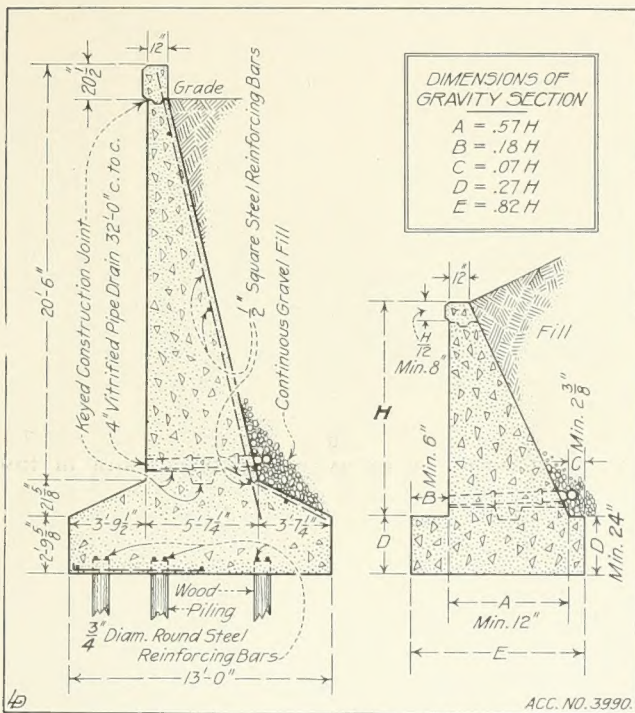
CROSS-SECTIONS OF TYPICAL RETAINING WALLS BUILT IN DAYTON.
